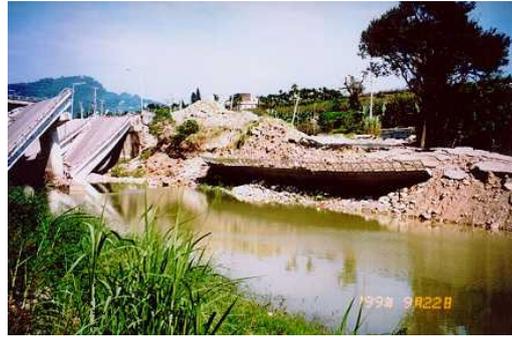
(b) The southern retaining wall collapsed (Shi-wei bridge)
